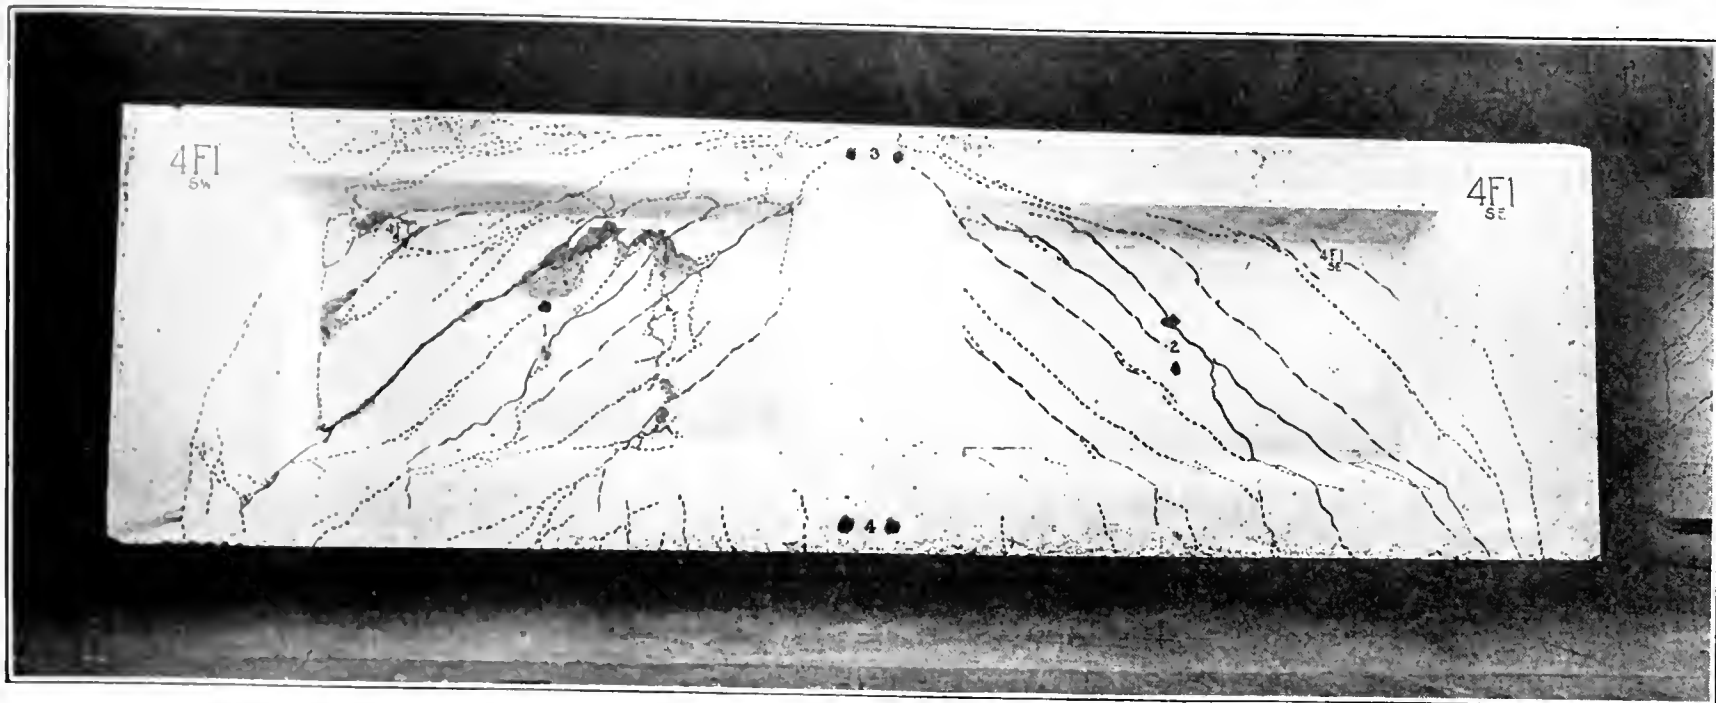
SHEAR CRACKS IN DEEP CONCRETE BEAM TESTED FOR CONCRETE SHIP WORK
